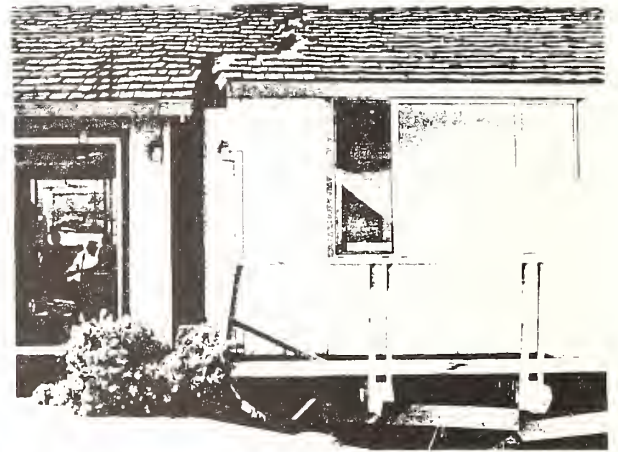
Break in house between kitchen and recreation room. The kitchen floor was wood framed over a crawl space. At the right end of the house, the crawl space became the garage. All of the major floor and wall framing members had unspliced joints at the break.
